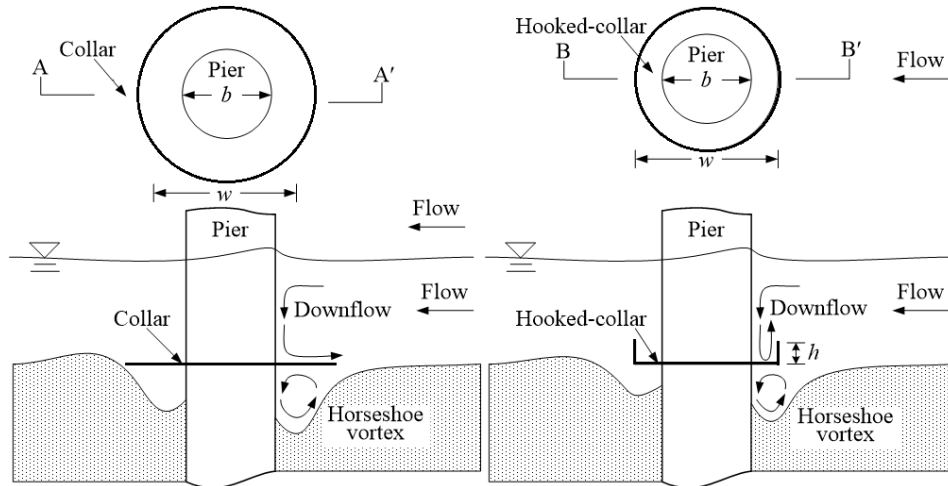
Circular and hooked collars for piers (Chen et al. 2018)
